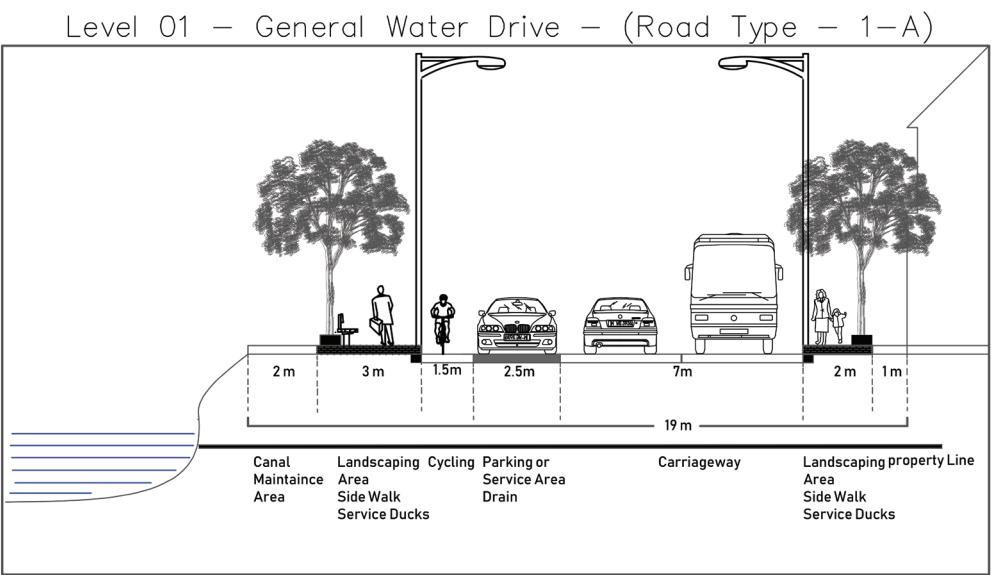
Cross section of a Level 01 – General Water Drive - (Road Type - 1–A)
